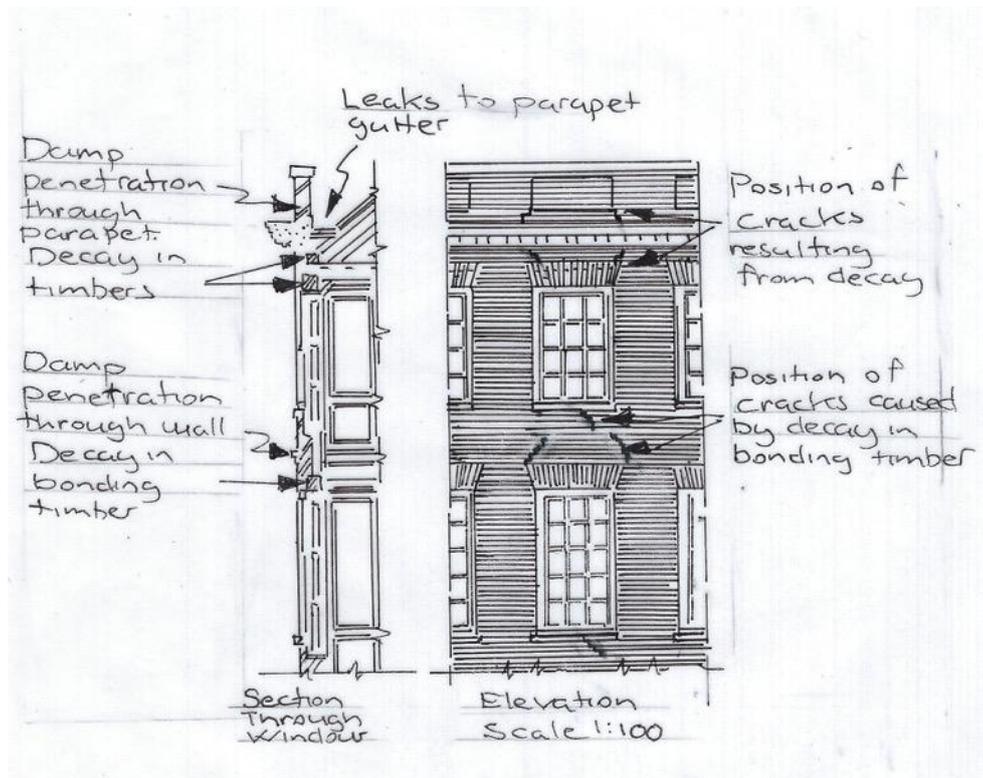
Decay to timbers embedded in solid brick walls, adapted from Melville *et al*, *Structural Surveys of Dwelling Houses*, p.91.
